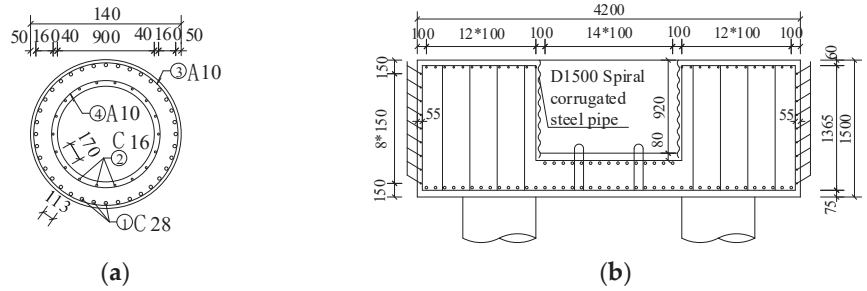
Reinforcement diagram of the full-scale bridge pier. (a) Pier section; (b) cap reinforcement.
